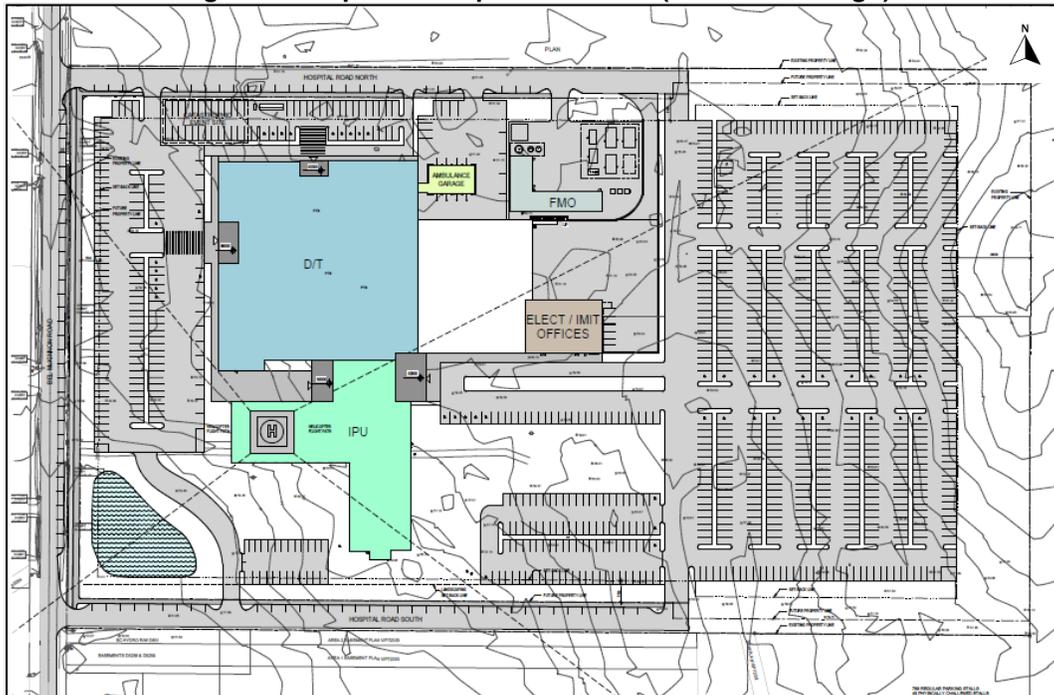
Proposed Hospital Site Plan (Indicative Design)
